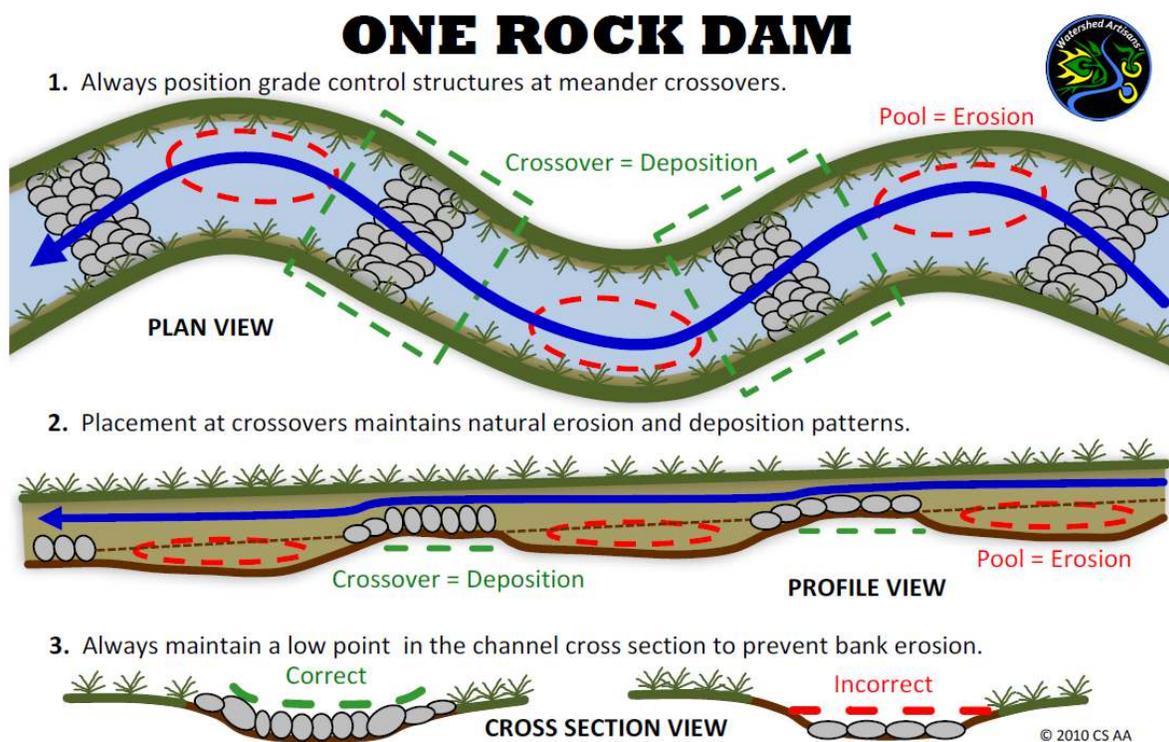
One rock dam plan, profile, and cross-sectional views (Sponholtz and Anderson 2013; figure courtesy of C. Sponholtz). Note how ORDs are placed at the meander crossover or riffle.
